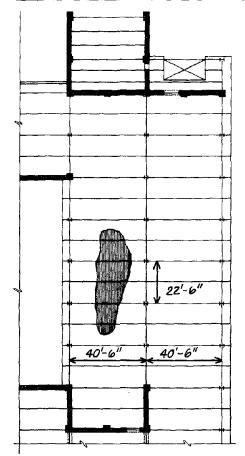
Careful penetration of shear walls with openings for corridors and service ducts.
